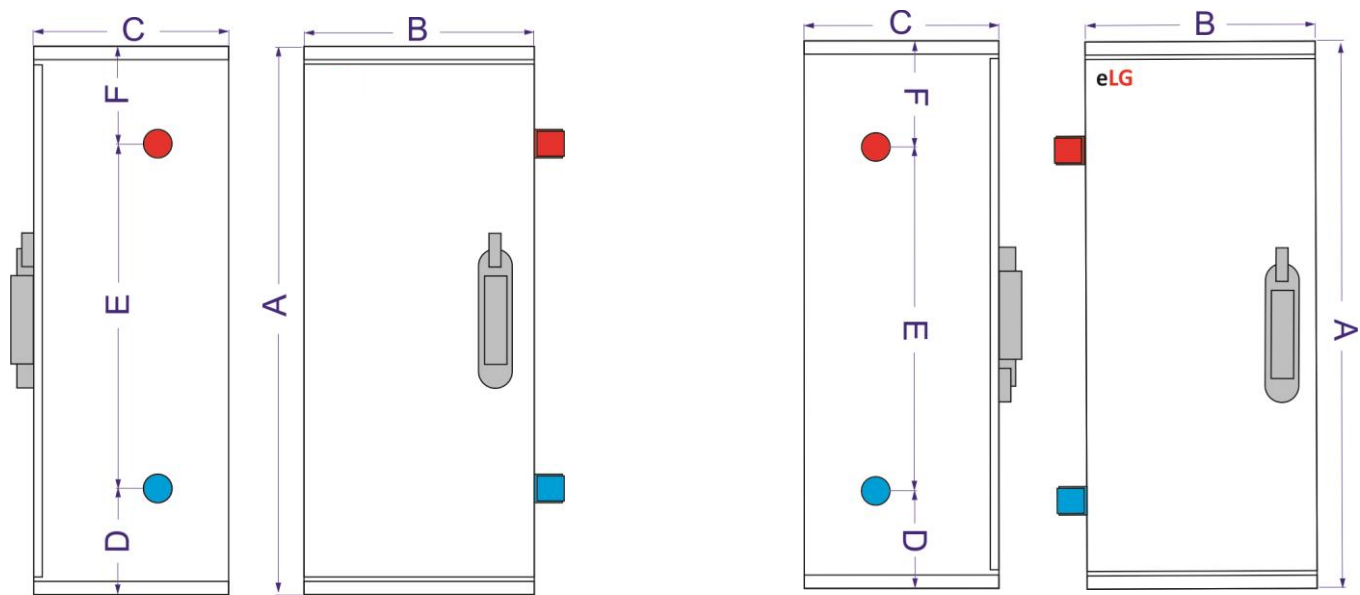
Boiler dimensions TK-eLG 6 kW - model IP54 for outdoor installation with hydraulic connections on the right or left side
